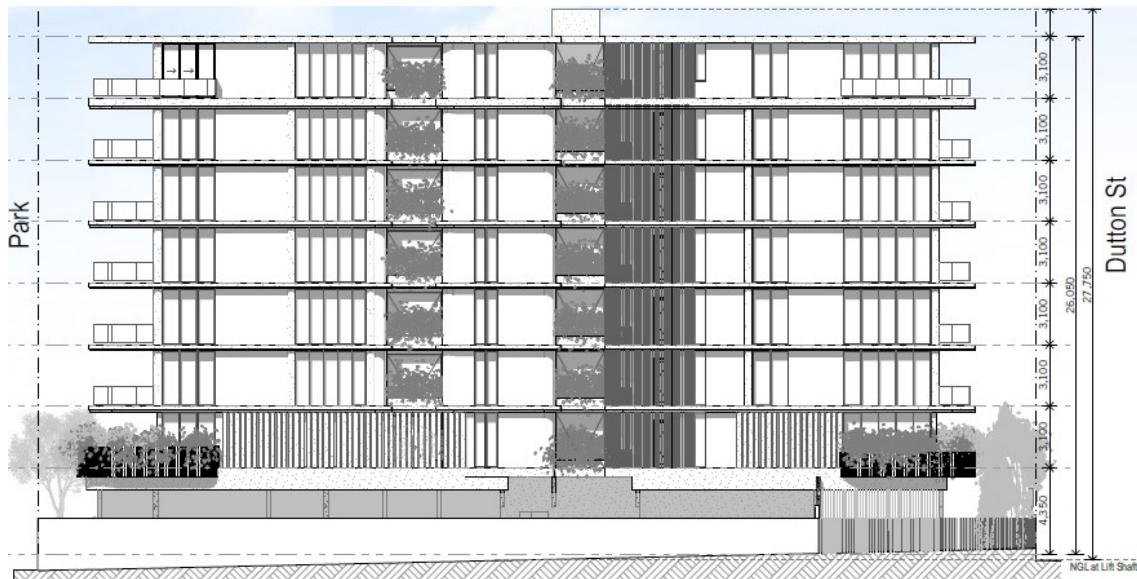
Side (north) elevation (Source: Lightwave Architecture)
